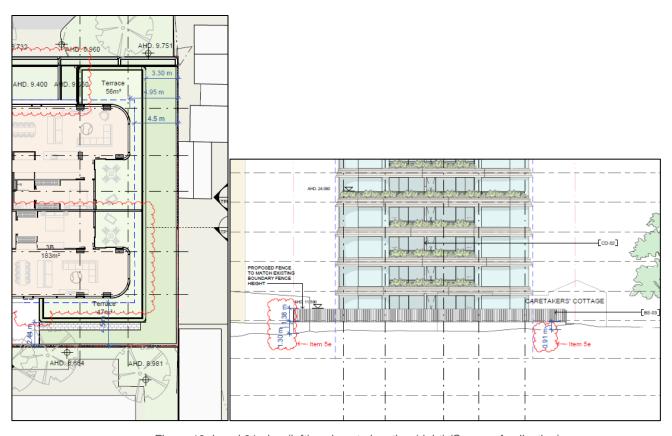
Level 01 plan (left) and east elevation (right) (Source: Application)
